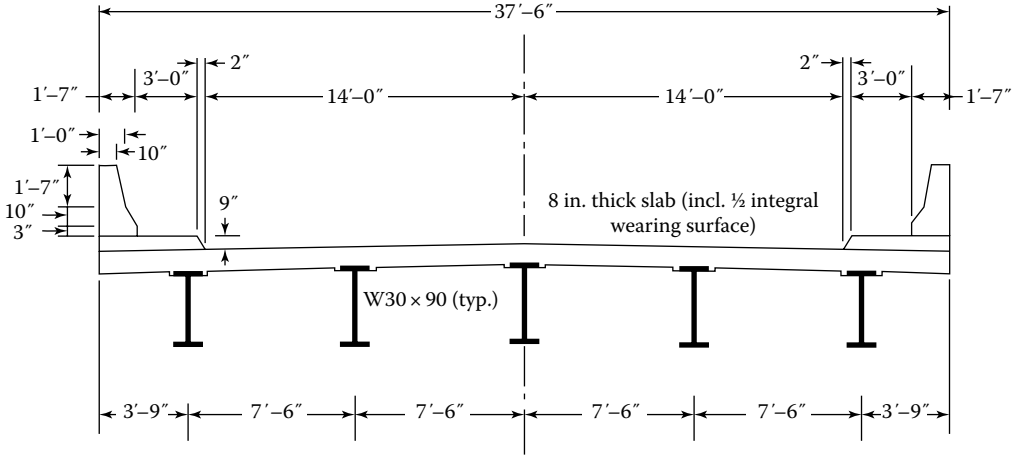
Cross section of slab-WF steel beam bridge.
